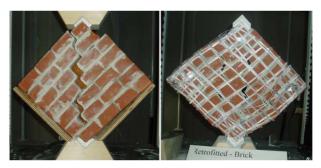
Failure patterns of burned brick masonry wallettes (left) without retrofitting (right) with retrofitting (10)
